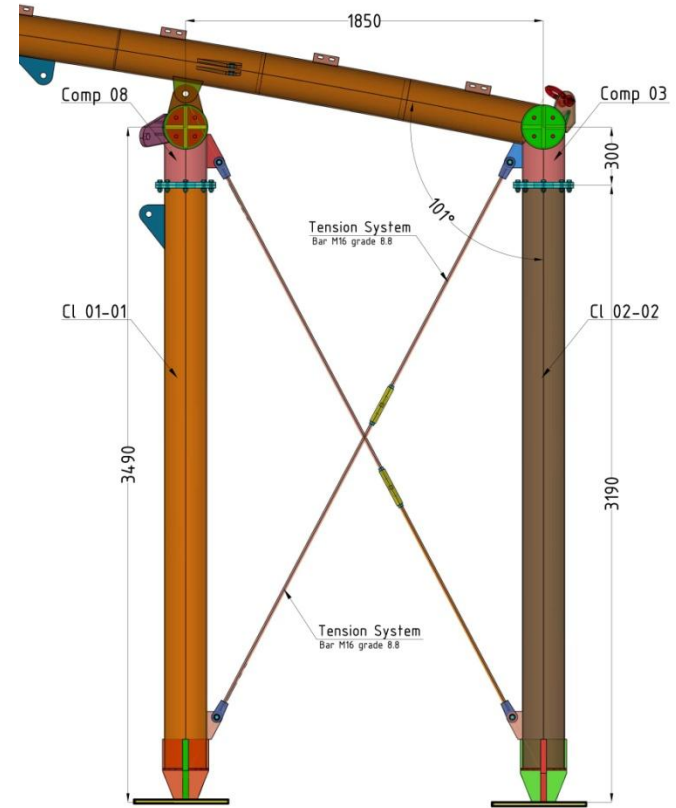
The above image shows the bracing detail for connecting columns to each other in bottom and top part and help them work as a single truss to prevent columns from torsion.
